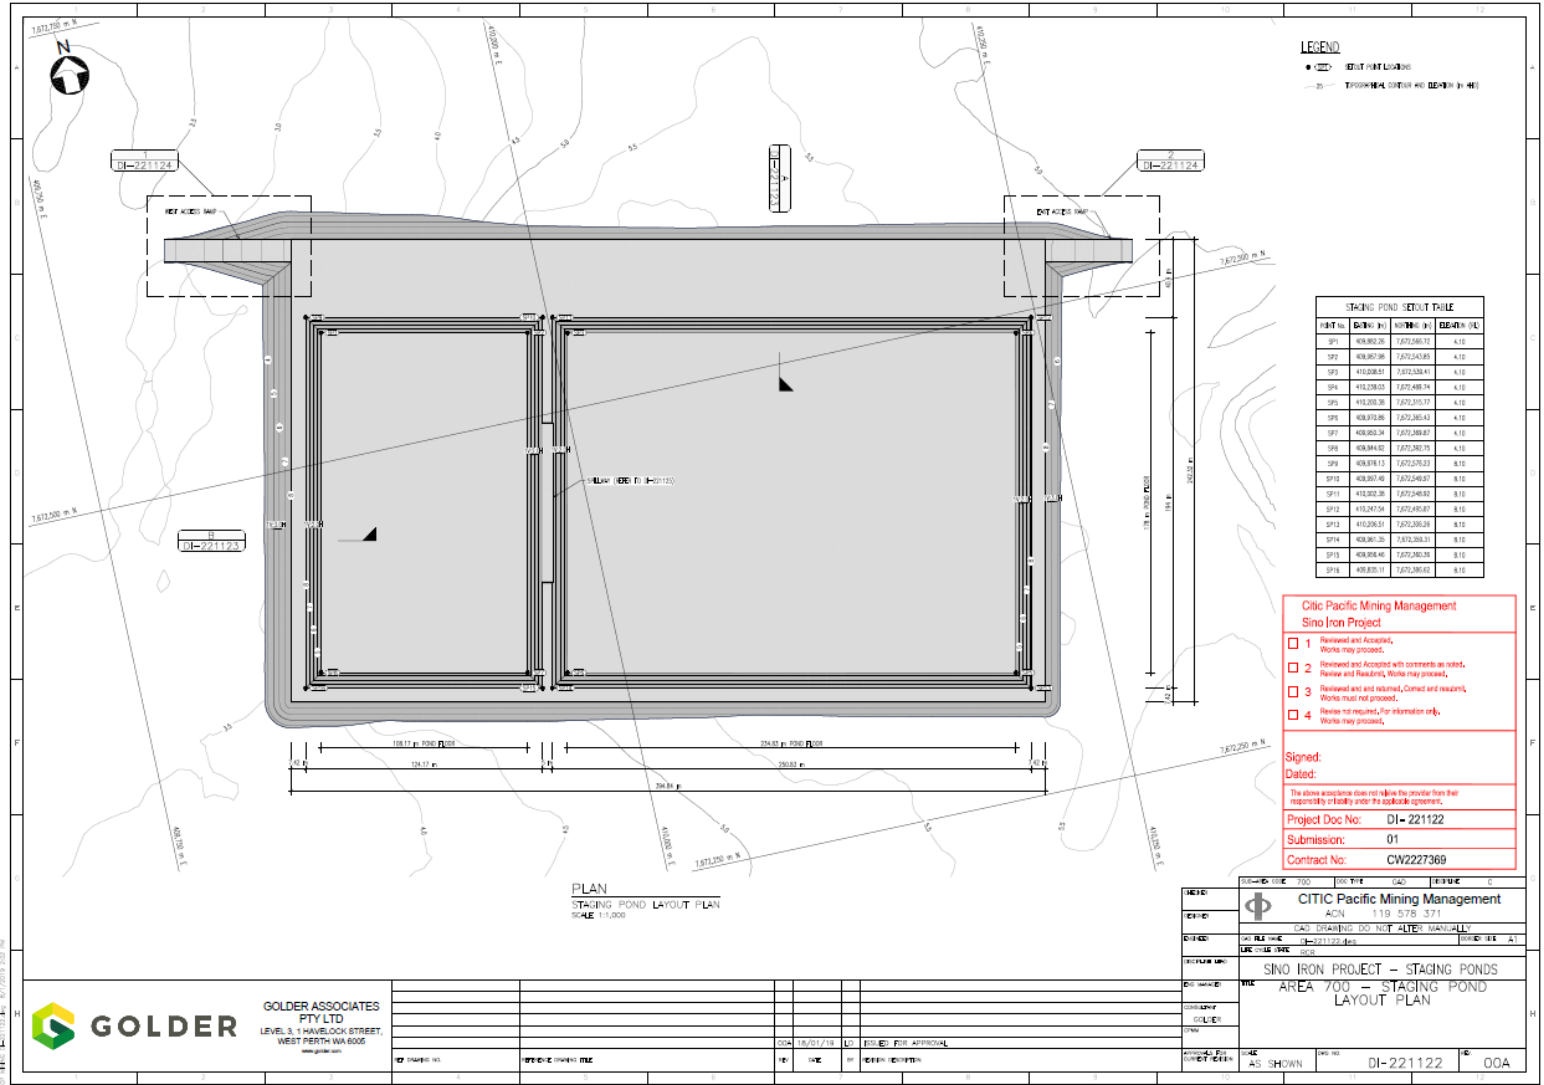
Mine dewatering staging facilities layout plan (CITIC Design Drawings, 2019)
